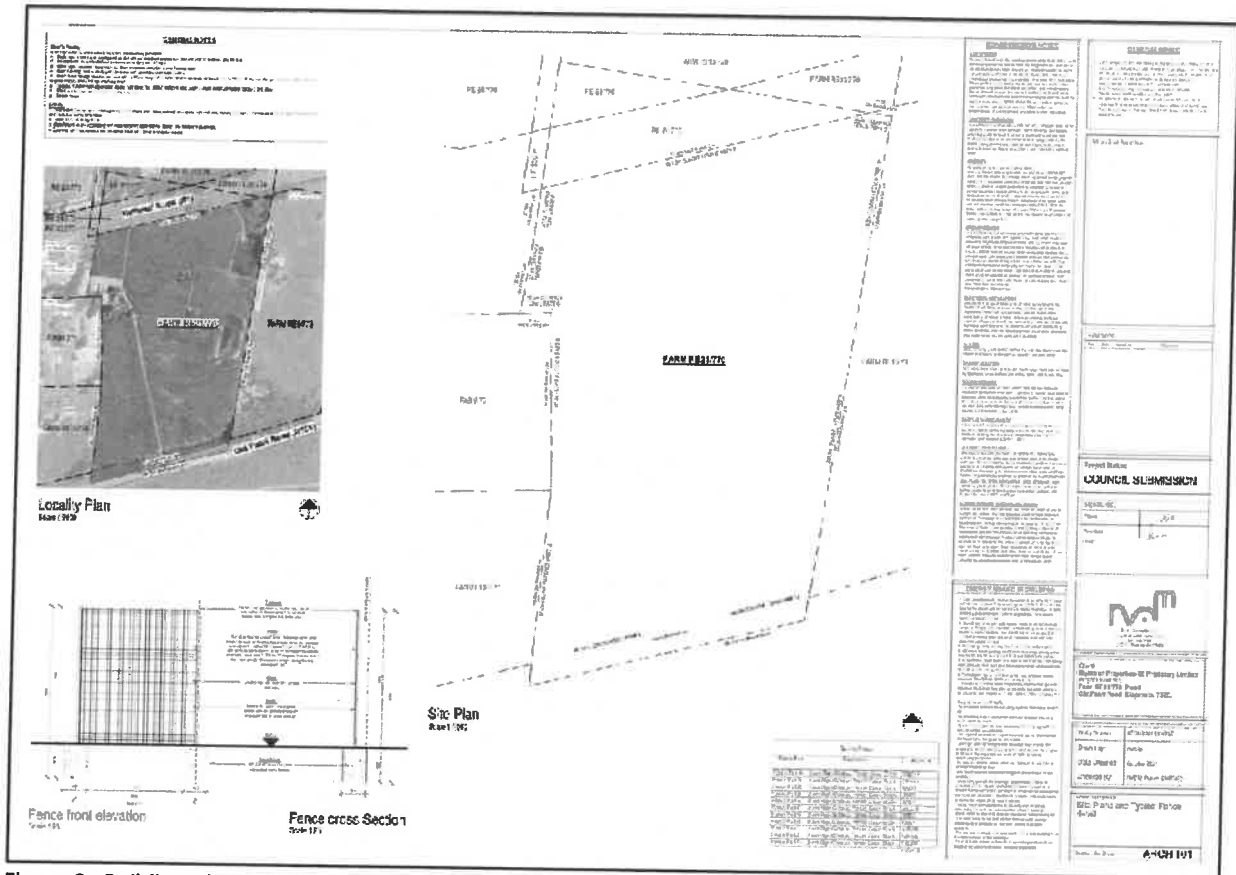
Building plan for the fence on Portion 21 of Farm No. 770, Paarl
